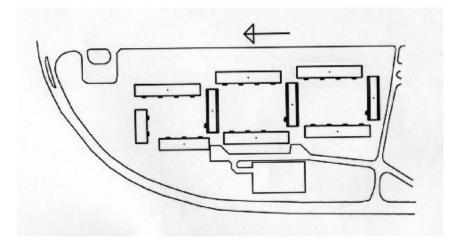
Site plan showing the Solhus project comprising three blocks with 10 buildings.
